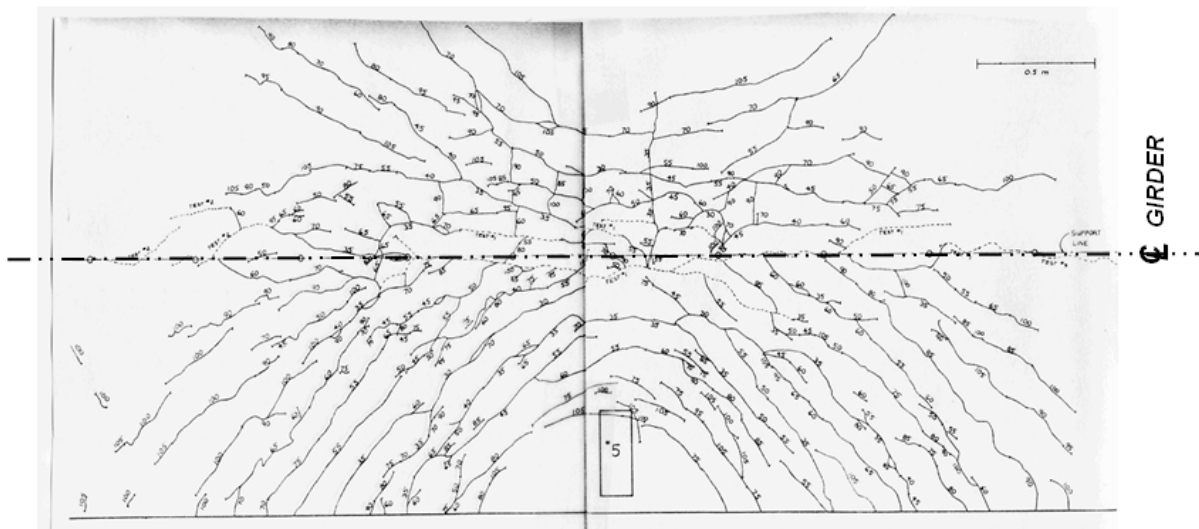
Crack patterns in cantilevers subjected to a concentrated load (Drysdale, 1982)
